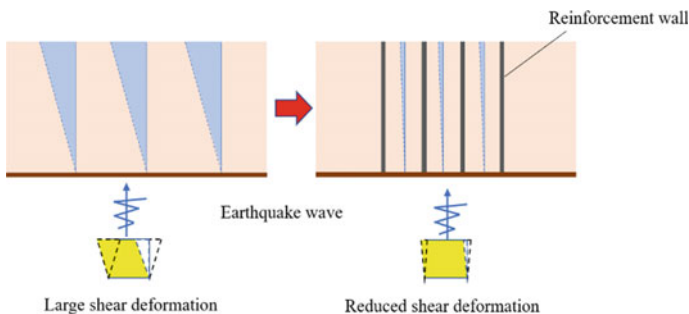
Liquefaction mitigation mechanism of grid form wall
